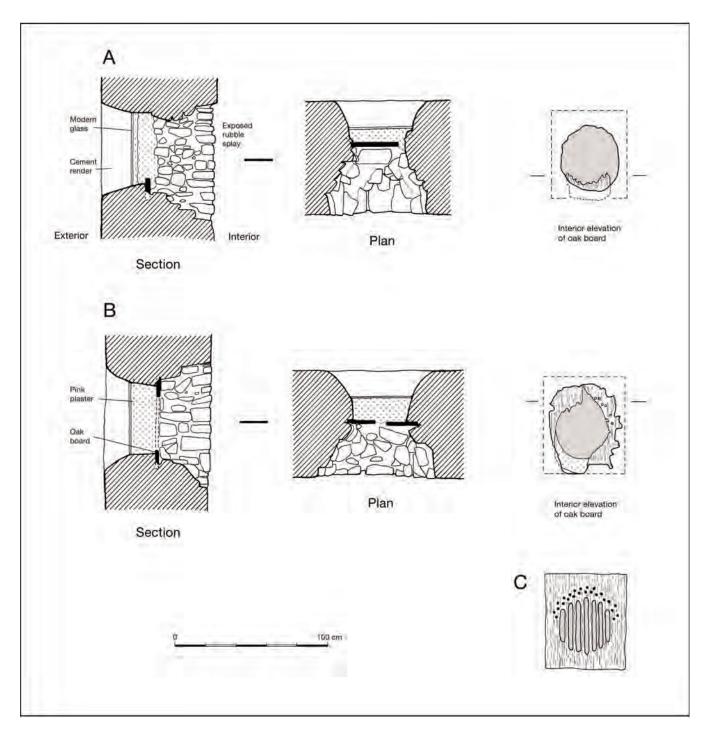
Western annexe. Plans and sections through the oculi in the west wall, and internal elevations of the surviving fragments of pierced window-boards contained in them. A, lower oculus; B, upper oculus; C, reconstruction of a window-board. Scale 1:25. Drawings: Stephen Coll and Warwick Rodwell
